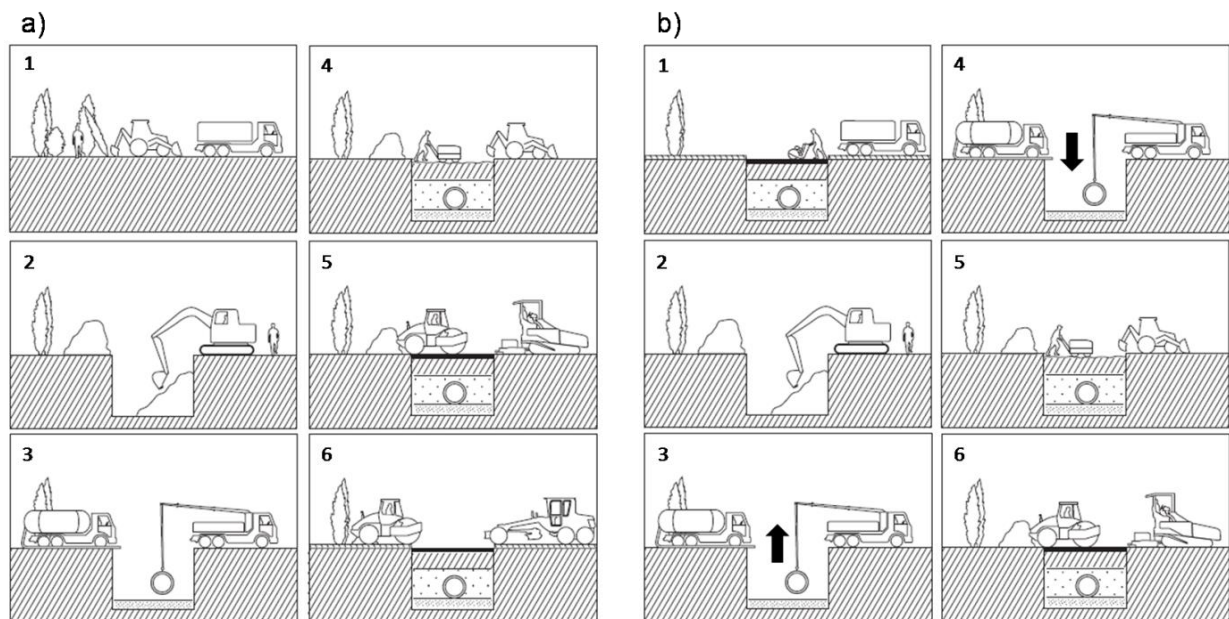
Illustration of the required steps to construct and renovate a sewer pipe located in a non-urban area with traffic: a) Construction. b) Renovation.
